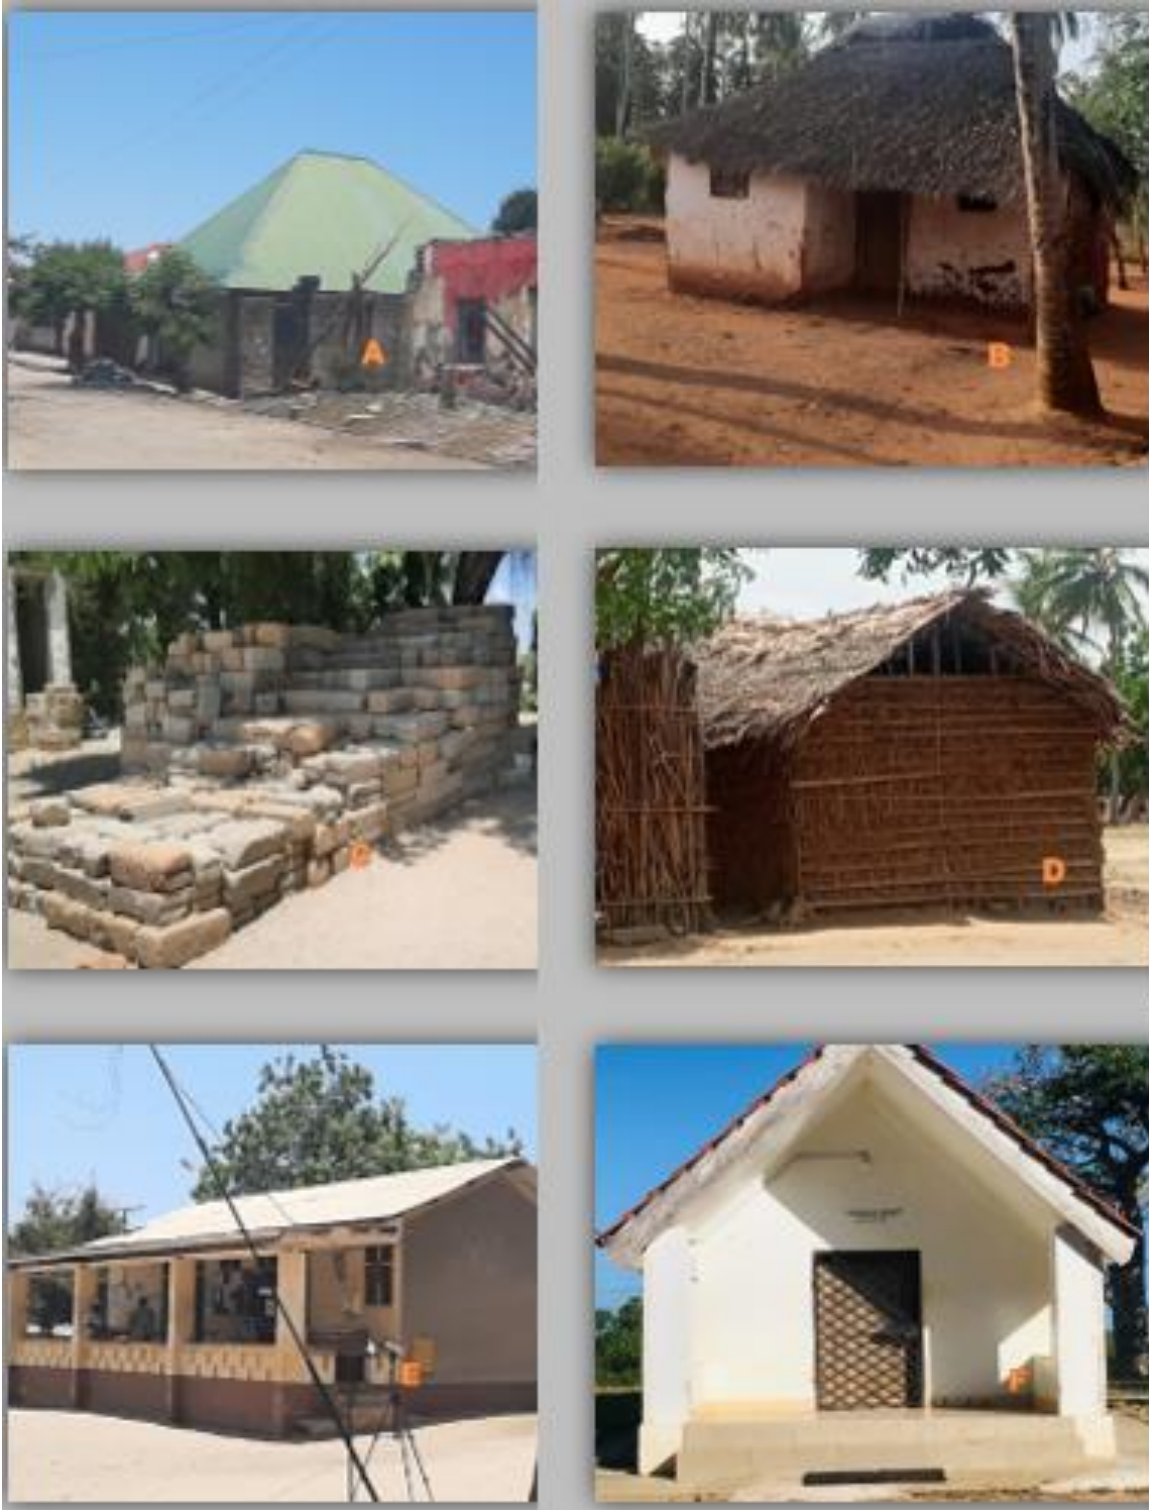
The typical building structures and materials used: A – house with iron sheet; B – house roofed with grasses C – Cement/Sand Blocks; D- house with mud/clay wall with grass roof; E and F – houses roofed with iron sheet and tiles and wall plastering (Source: Tansheq, 2022)
